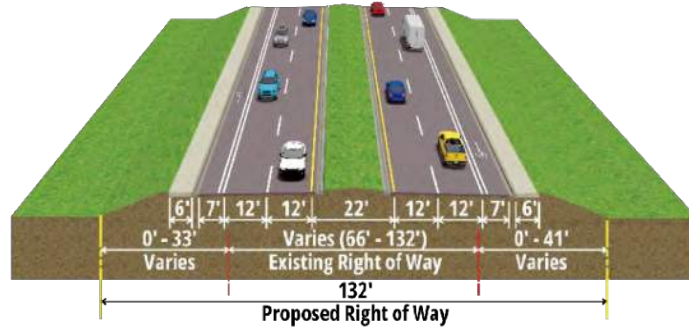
S.R. 60 PREFERRED TYPICAL SECTION 1
